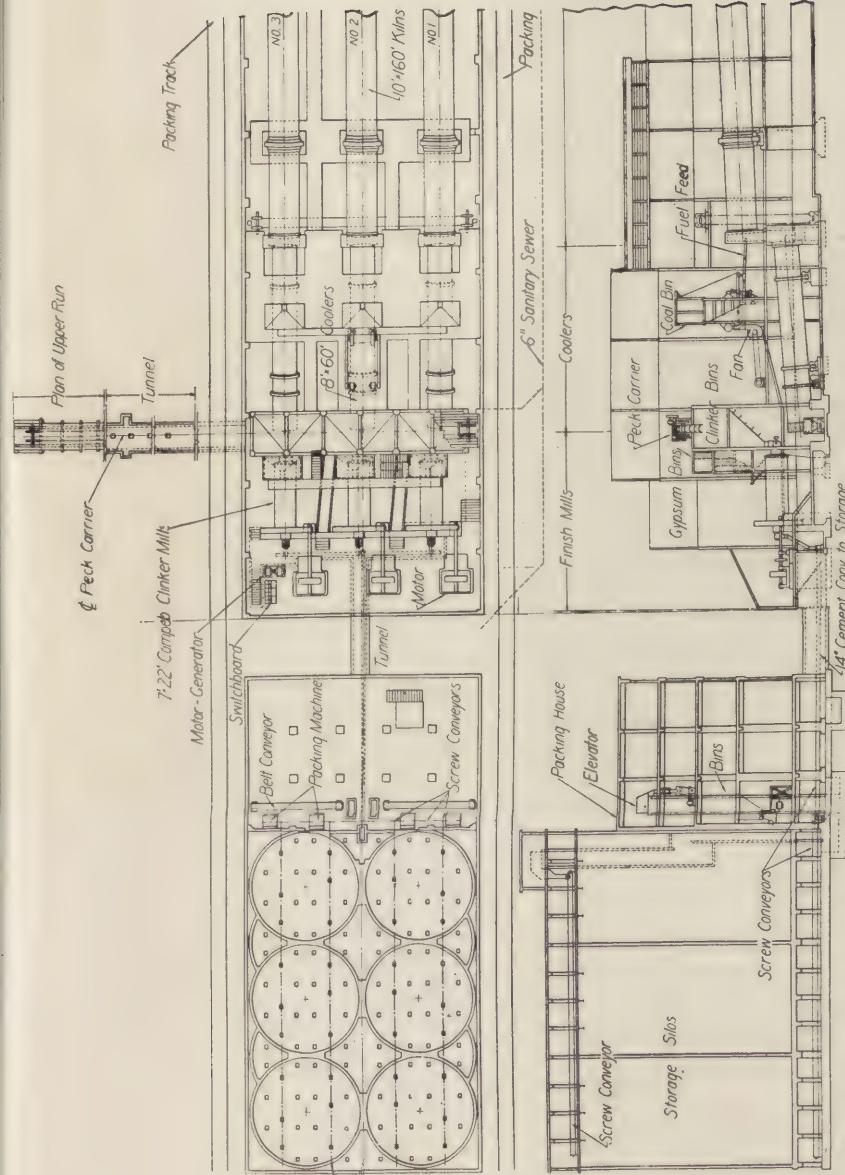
b.—Plan and elevation—Manitowoc Portland Cement Co., Manitowoc, Wis., discharge end of kilns, coolers, finishing mill, stock house, and pack house.
